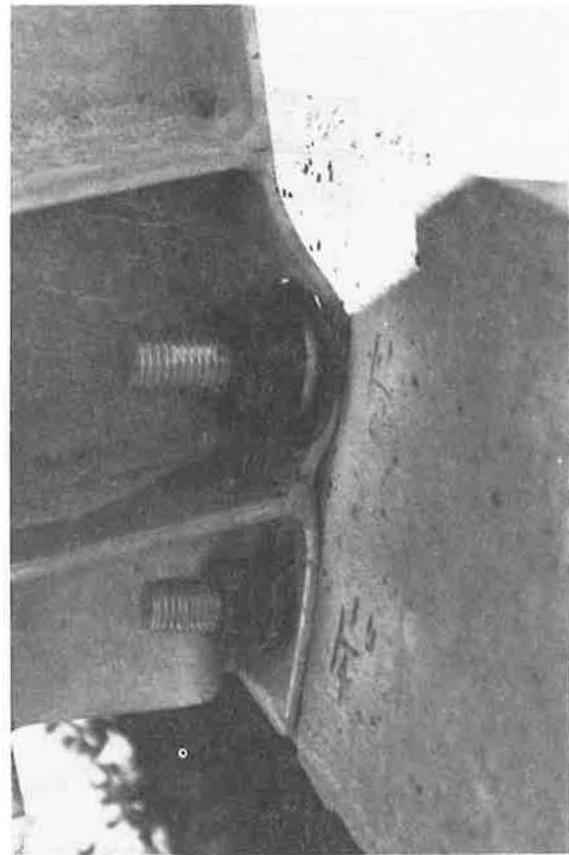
Buckled web contacted lower fastening nut on Post 6.
